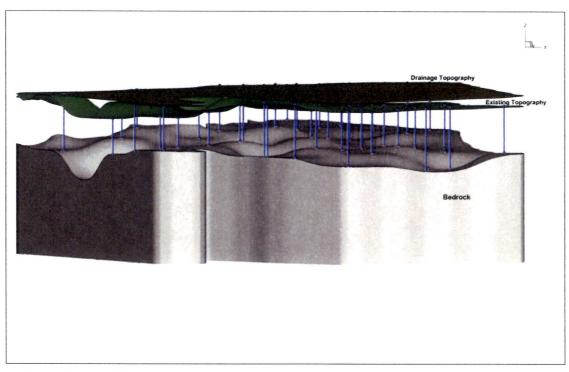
Surveyed Corehole Locations and Elevations, Shown with Drainage Plan and Bedrock Surfaces, Survey Unit 4
